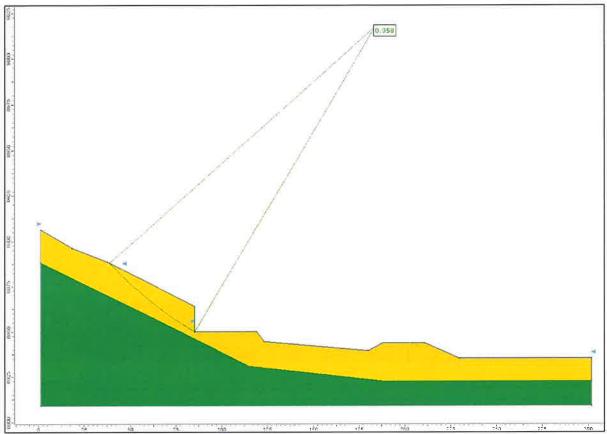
Unrestrained Estimated 14 foot excavation cut slope conditions along Profile 6, F.O.S. 0.958.
